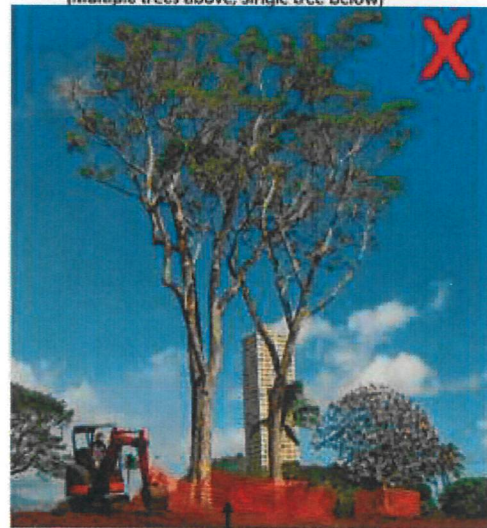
Weak fencing is not enough for protecting trees in construction site.
